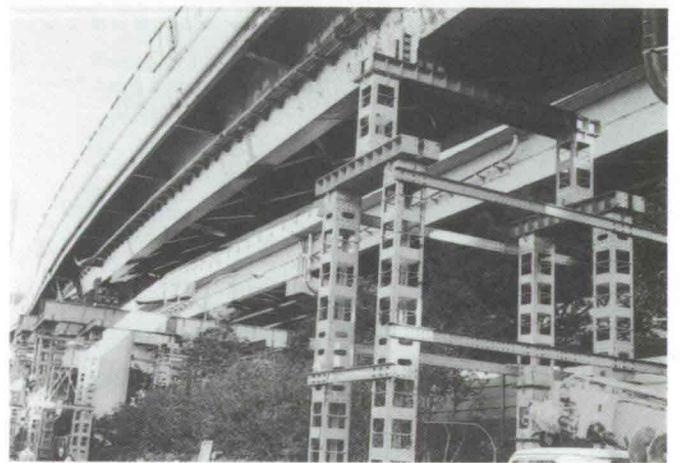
Preventing the collapse of concrete viaduct pier (1)
